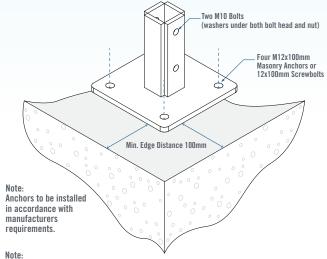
FIXING TO EXISTING MASONRY - CONVENTIONAL MASONRY VENEER CONSTRUCTION
